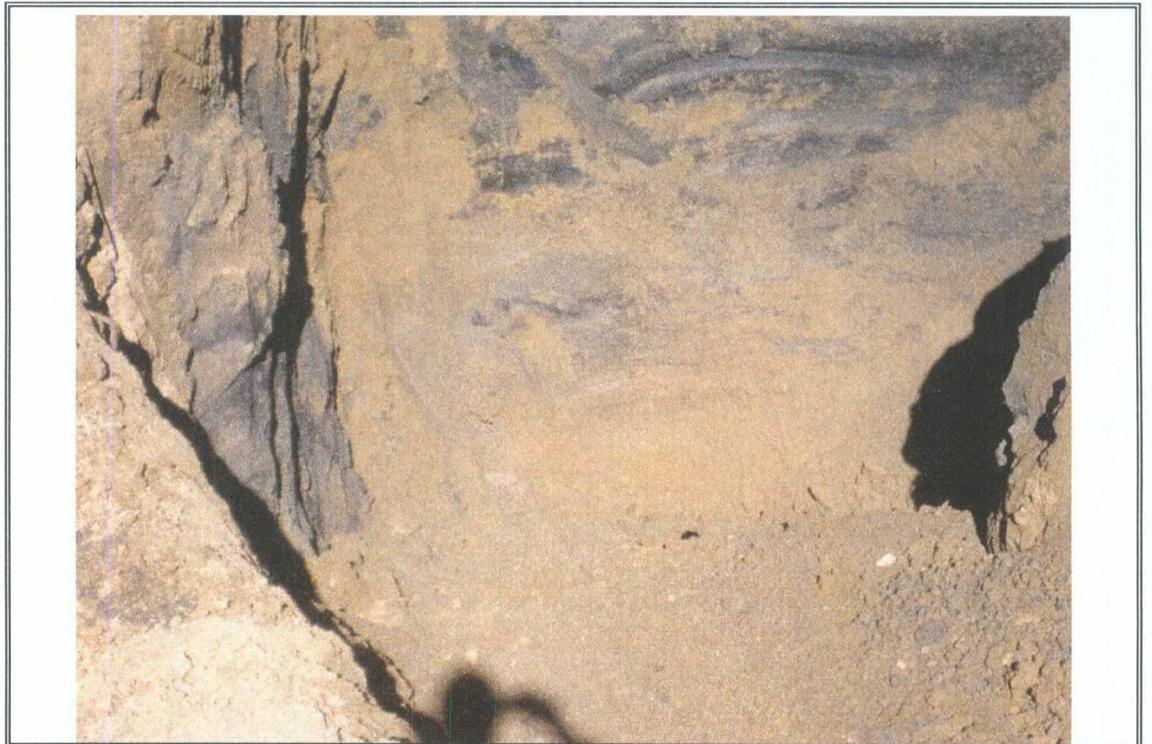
Photograph Number 7: View of remediation along the west wall of the former Clark building.
